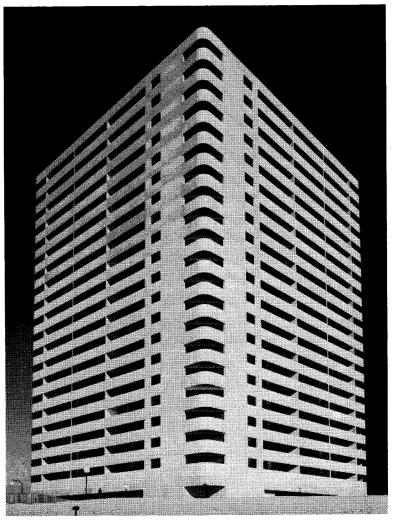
Atlantis Condominiums, Ocean City, Maryland. This 22-story building is comprised of precast floor slabs, wall panels, spandrels, and stair and elevator towers.
